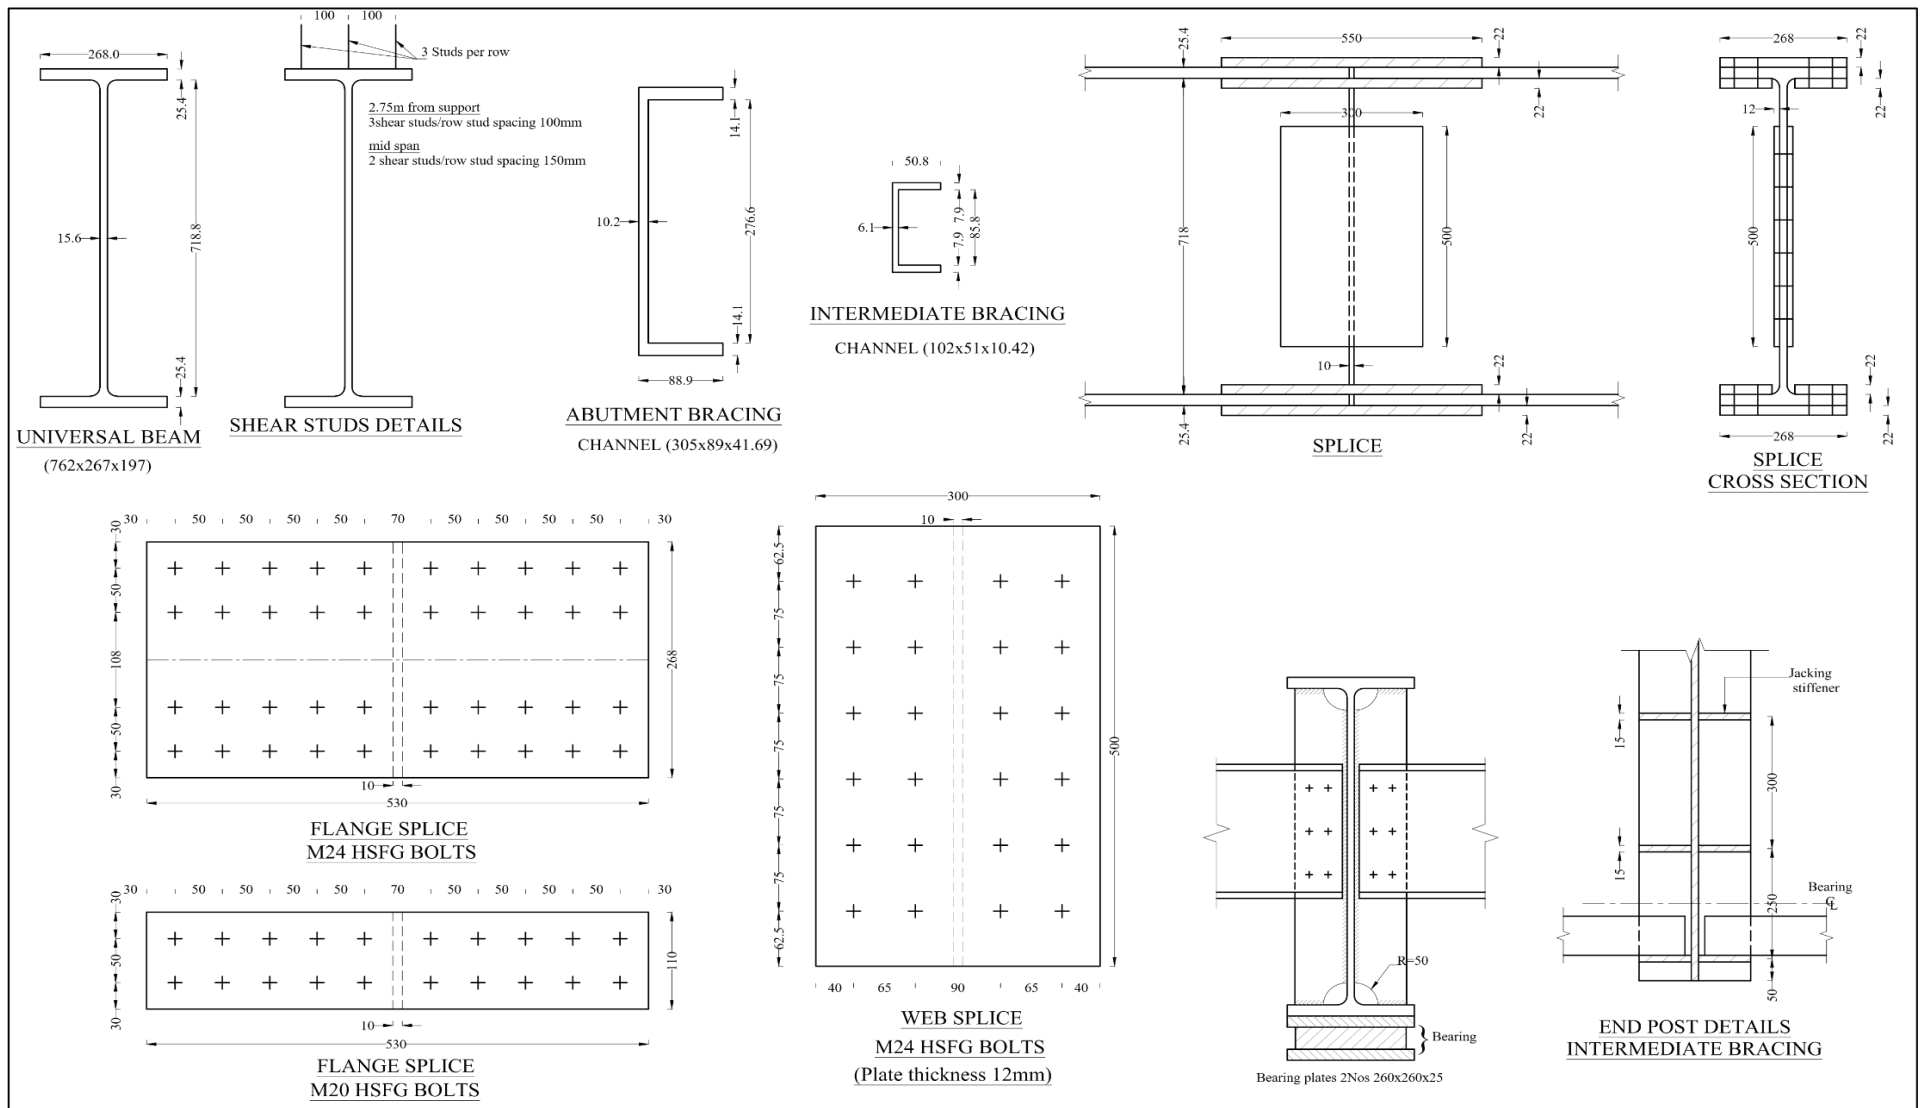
STEEL CONCRETE COMPOSITE BRIDGE DECK SPAN 17.5M
